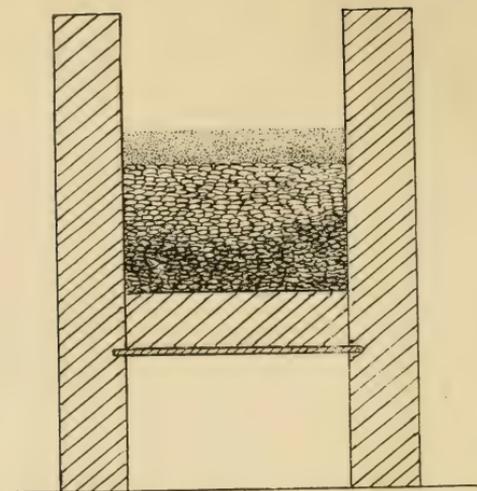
Showing how a mud bin can be formed on the floor inside mud-walled houses or huts.
